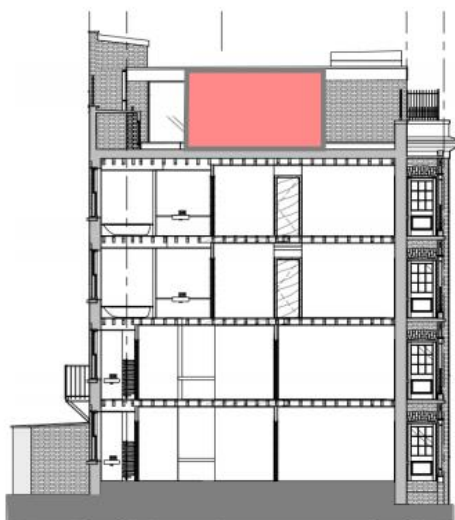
The HVRF plant will be housed in longitudinally orientated, centrally positioned metal-clad lightweight steel enclosures,
